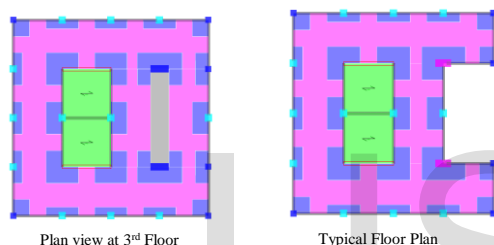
Model 3 Flat Slab with Columns and Shear Walls (G+25)
